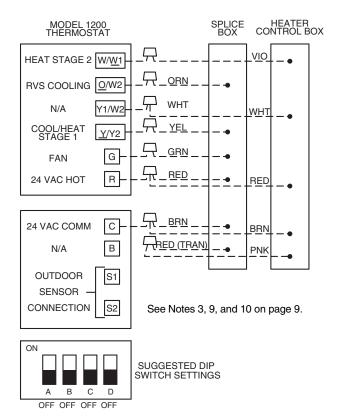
Single-Speed Packaged Heat Pump with 2-Stage Electric Heat — Model 1200 Thermostat
